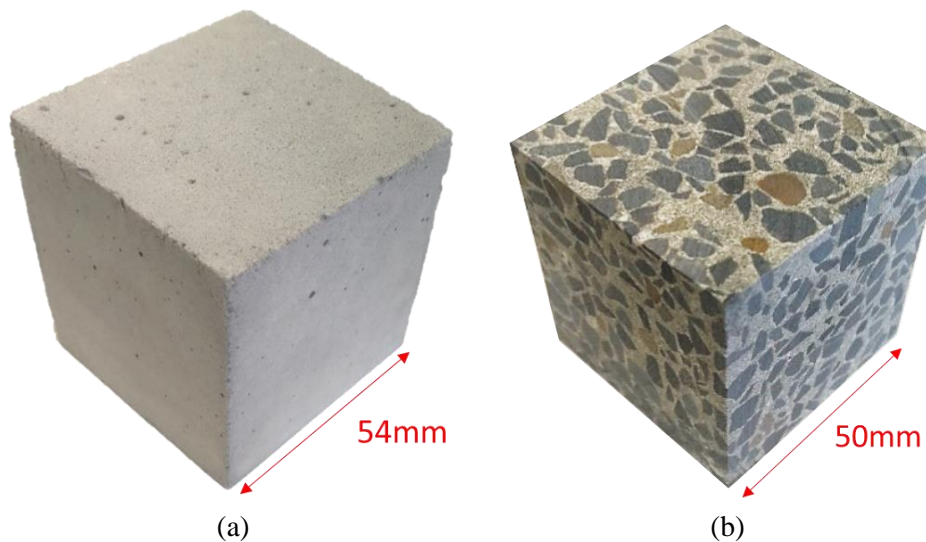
(a) Casted concrete specimen and (b) prepared concrete specimen.
